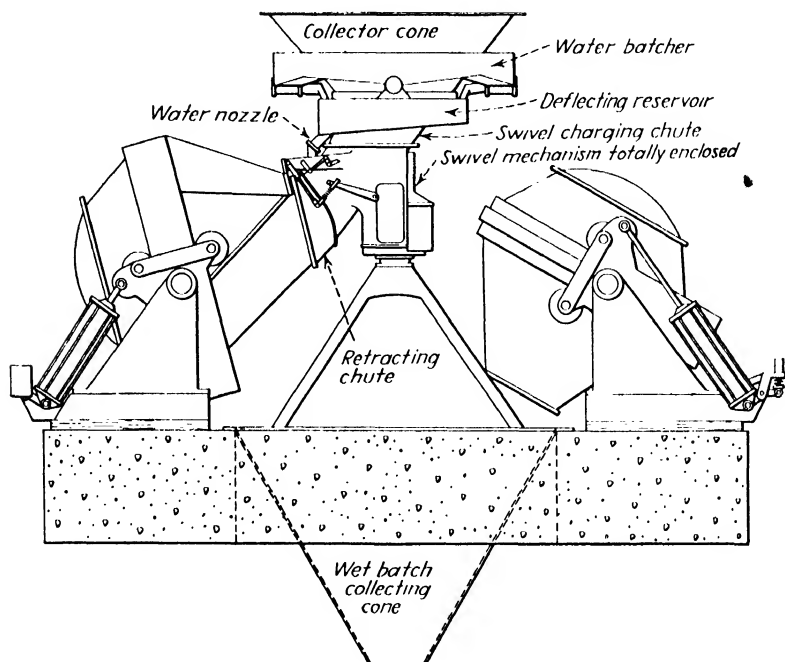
Modern arrangement of front charging and discharging tilting mixer in a large mixing plant.
